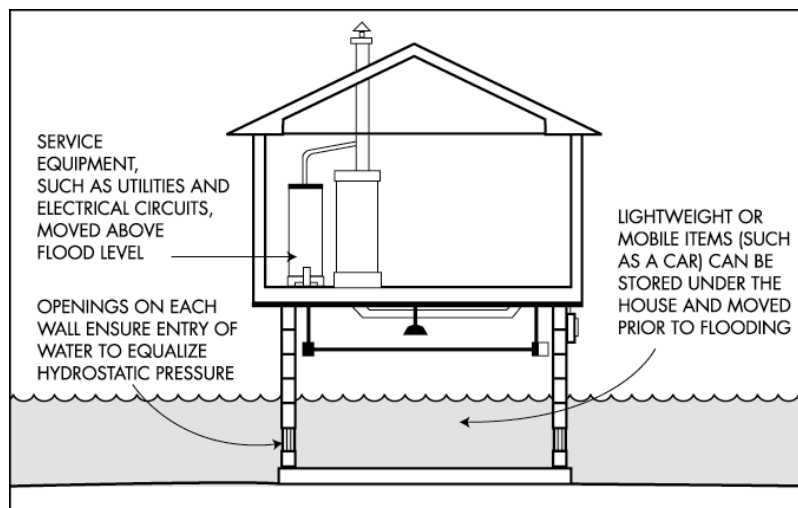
Typical Cross-Section of an A/AE Zone House Elevated on Solid Foundation Walls.
